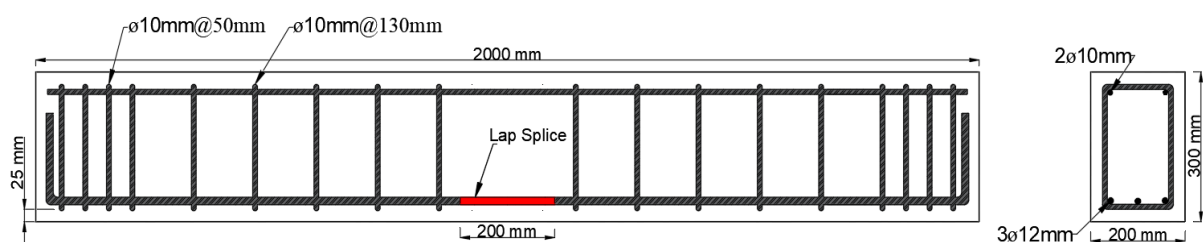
Details of reinforcement: (a) front view, (b) cross-section.
